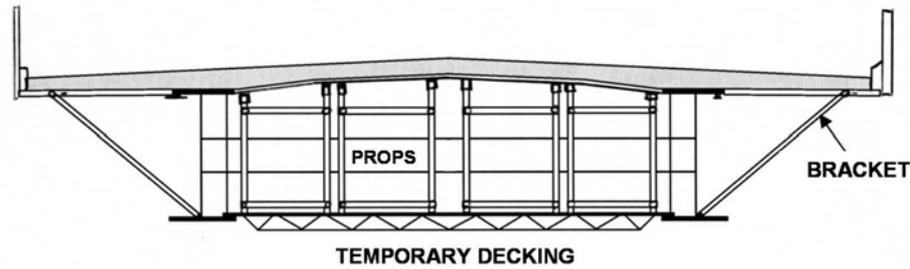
Conventional slab formwork for a twin girder cross-beam composite deck
